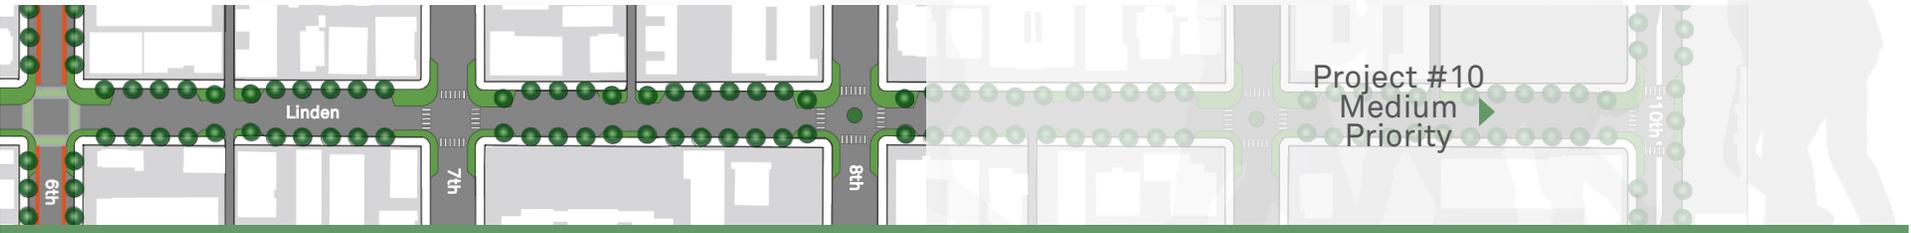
Linden Avenue - 6th Street to 8th Street
